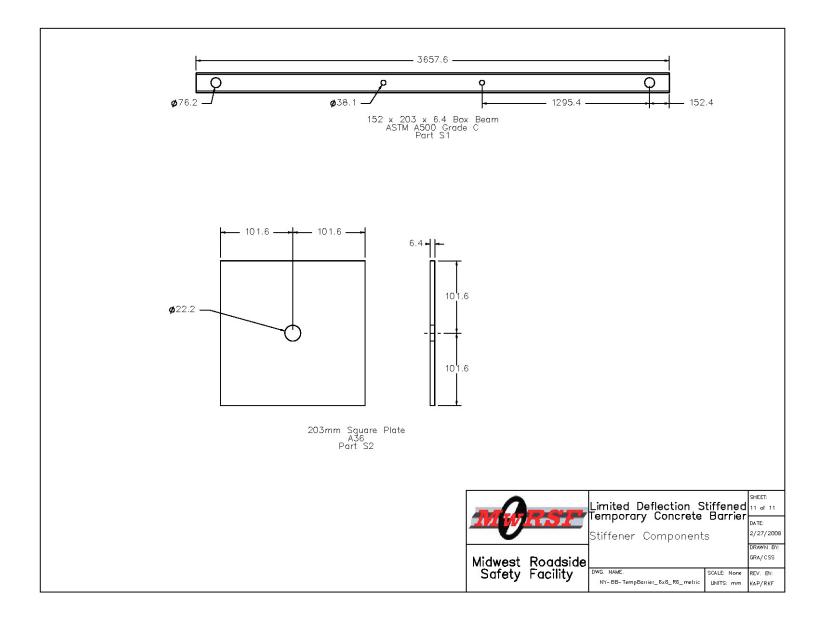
Box Beam Stiffener Details, Test NYTCB-3
